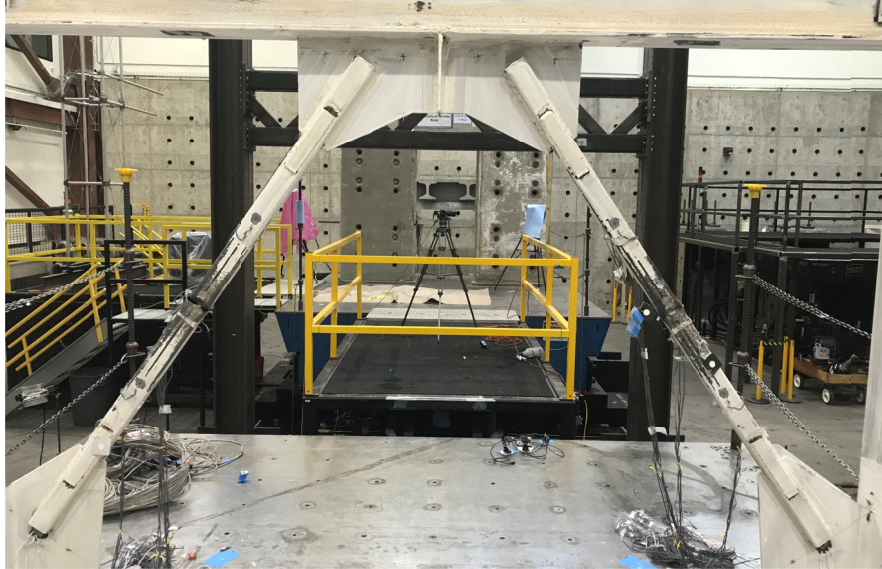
Specimen 1 elevation with both braces ruptured.
